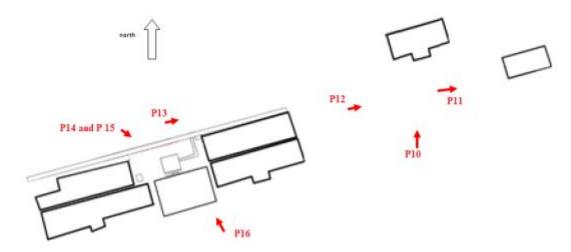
Above is a schematic layout of the site and the positions from where photographs were taken.
